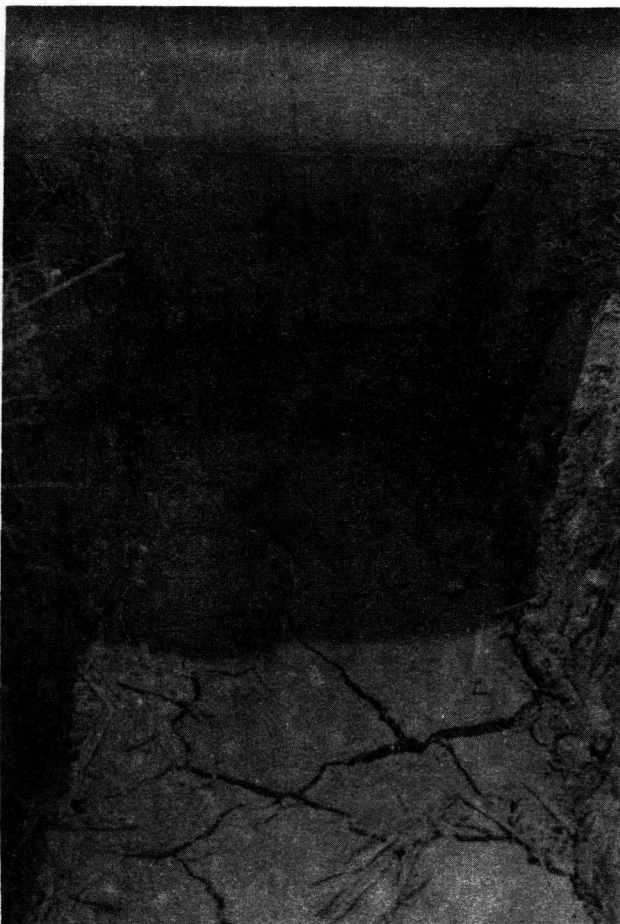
TRENCH CUT THROUGH BERM FROM PAVEMENT EDGE. WATER RAN FROM BENEATH THE PAVEMENT JOINT WHEN TRENCH WAS OPENED.
